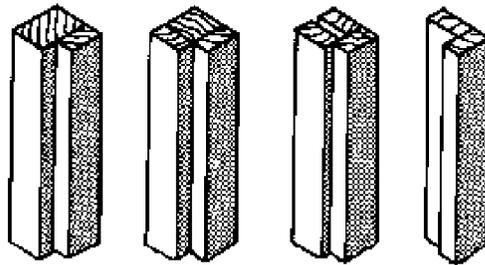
TYPES OF CORNER POST CONSTRUCTION.
